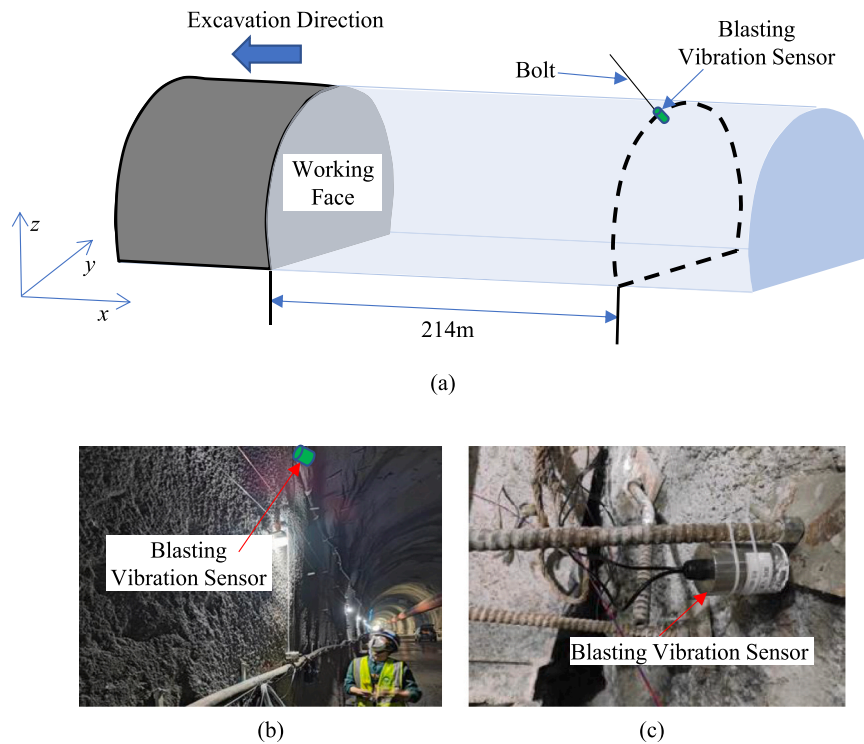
Field monitoring of blasting vibration: (a) blasting vibration sensor layout; (b) on-site sensor installation; (c) sensor-fixed installation method.
